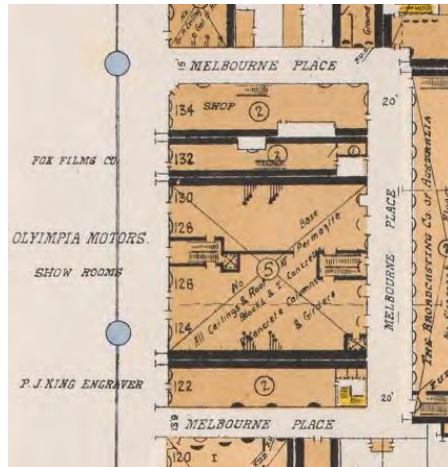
A fire survey plan surveyed in 1924 showing the internal plan of the building at 124-130 Russell Street. (Source: SLV)
